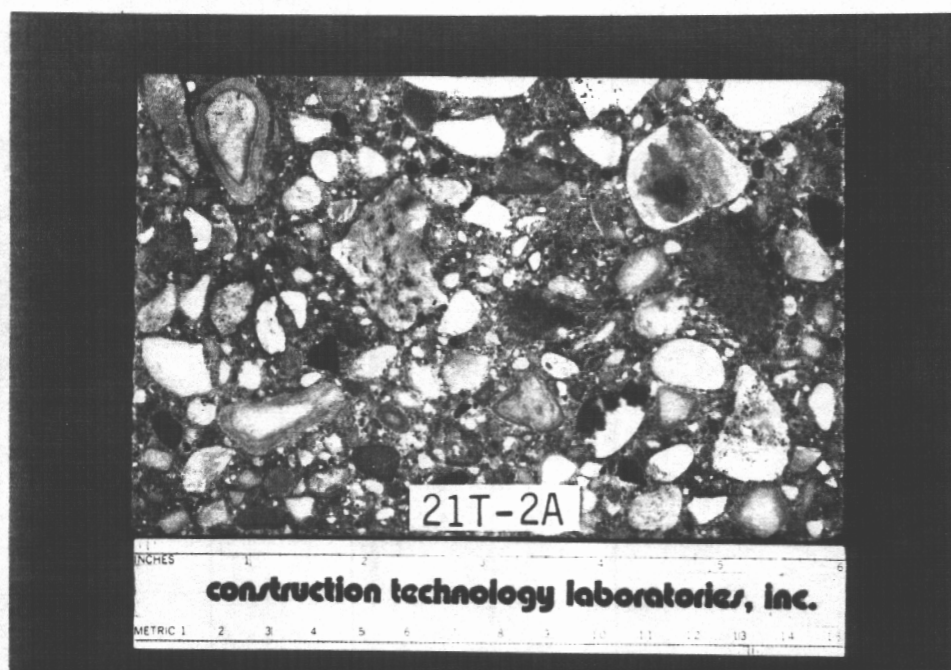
LAPPED SLICE SIDE OF CONCRETE SPECIMEN NO. 21T-2A.
